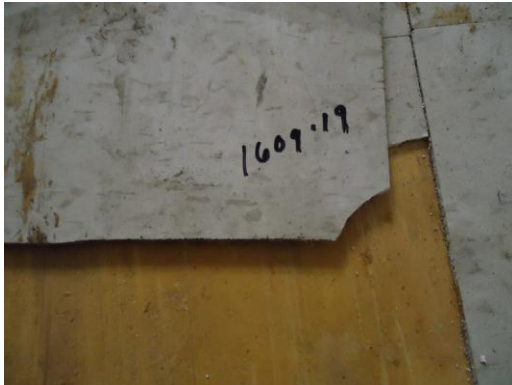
Floor Tile (1609-19) Bath. No Asbestos Detected
